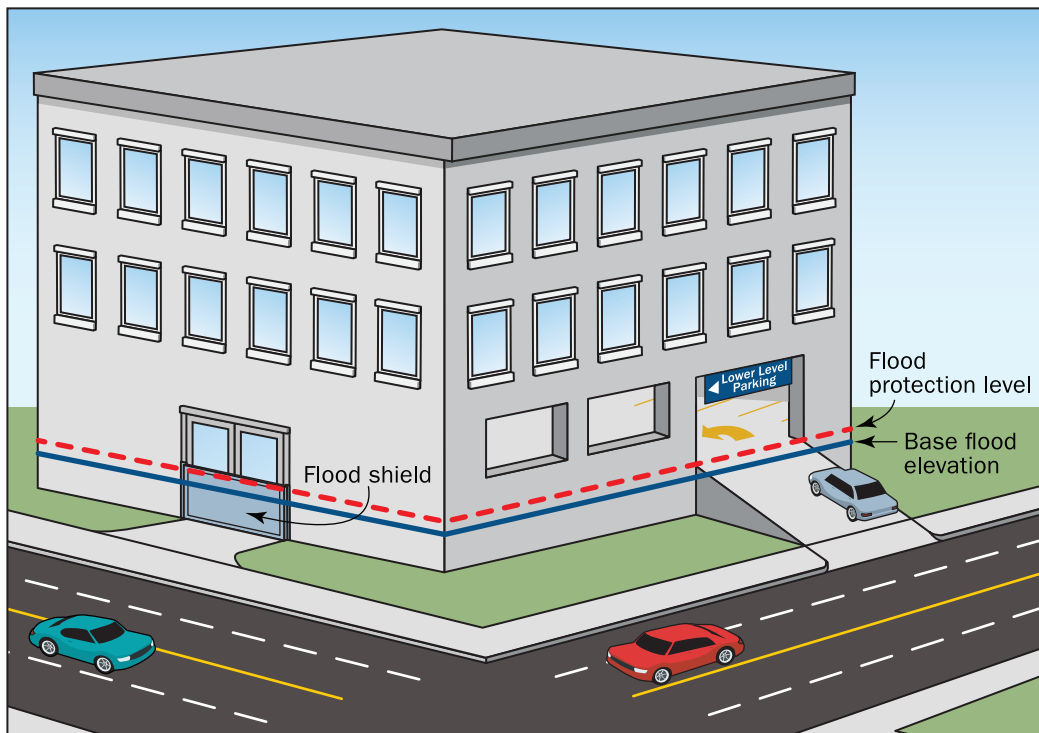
Raised vehicle ramp for dry floodproofed below-grade parking
